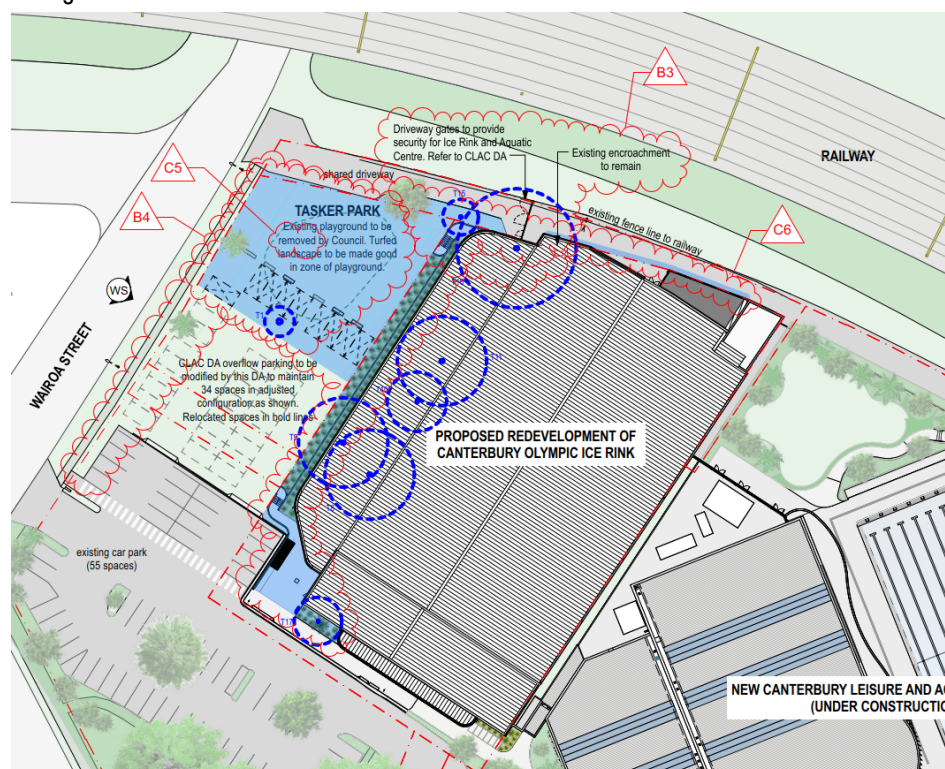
Proposed site plan overflow car parking arrangement (Source: Kennedy Associate Architects 2024 2221-DA090 Rev C)
